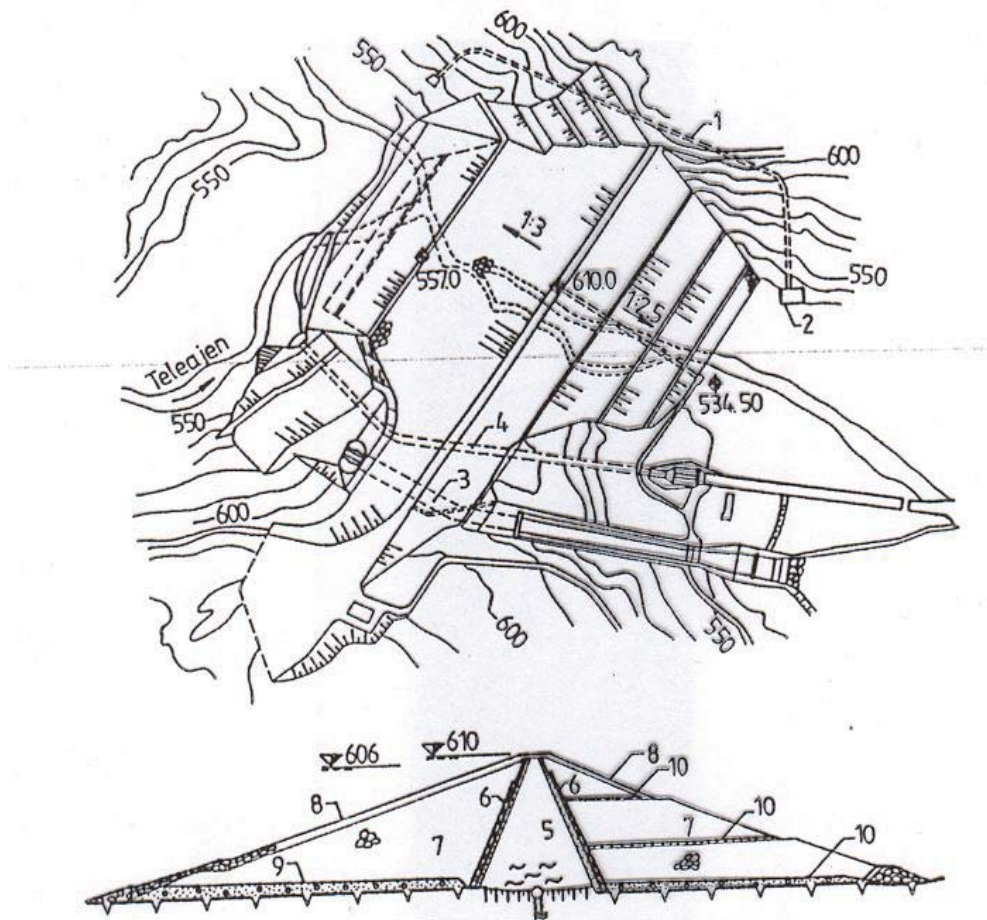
Maneciu dam: a - layout, b - typical cross-section; 1 - headrace tunnel, 2 - hydropower station, 3 - morning glory spillway, 4 - water outlet, 5 - clay core, 6 - inverse filters, 7 - alluvial vibrocompacted shells, 8 - rockfill protection, 9 - natural alluvial layer, 10 - seismic energy absorbent braces.
